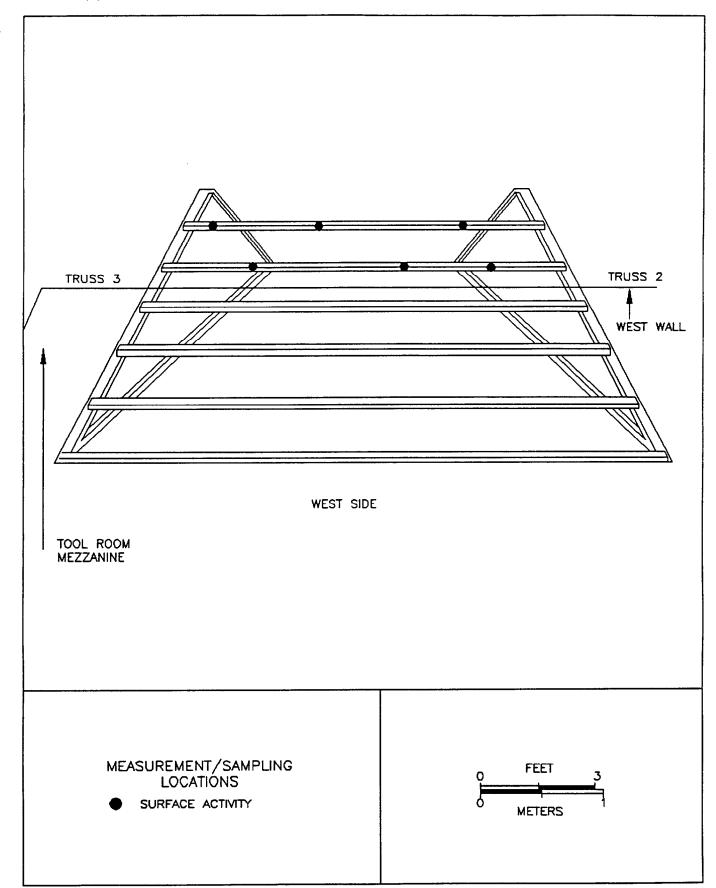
Building 8, Bay 2, West — Measurement and Sampling Locations
